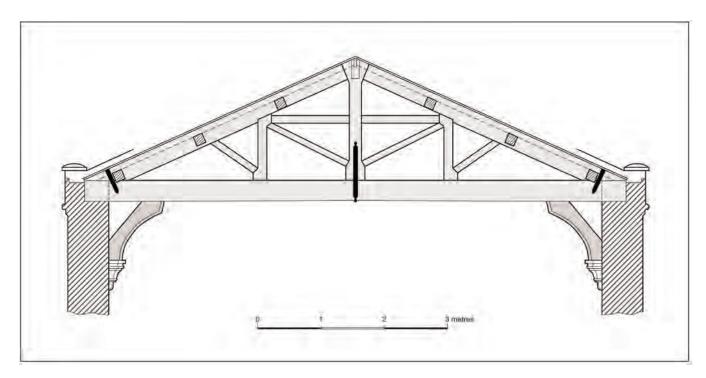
Nave roof. Elevation of the easternmost king-post truss of 1805, with later wall-brackets below. Scale 1:60. Drawing: Simon Hayfield
